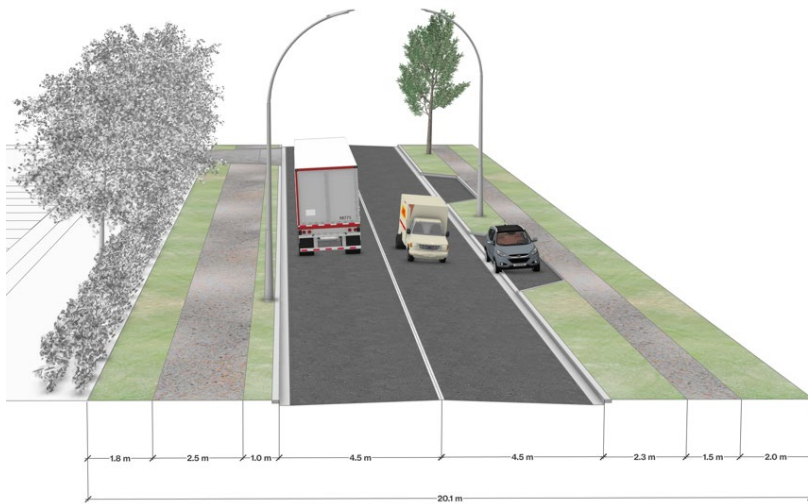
b: Indicative Typical Cross Section of the ultimate Northern River Crossing (Arterial), following upgrade of East-West Road
